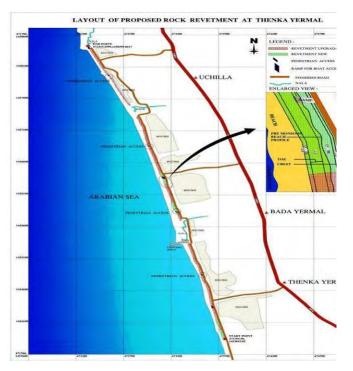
Layout of Proposed Rock Revetment at Yermal Thenka
